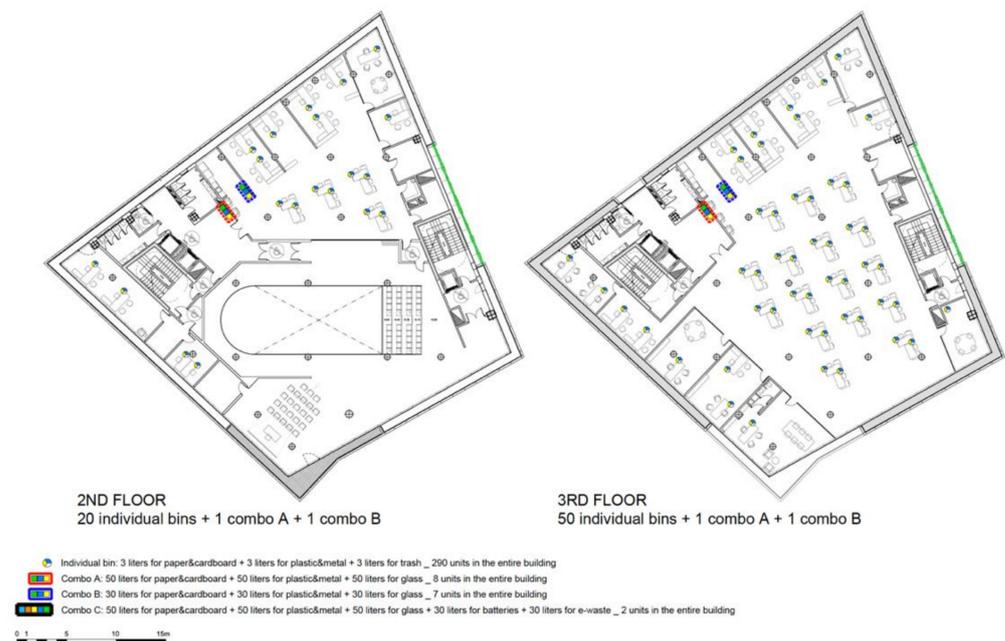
Location of waste collection points according to type of use and workstations. Upper floor of the Plenary Hall (first floor). Office type floor (Third Floor). Source: Castaño & Associates. LEED Rating System Report [59].
